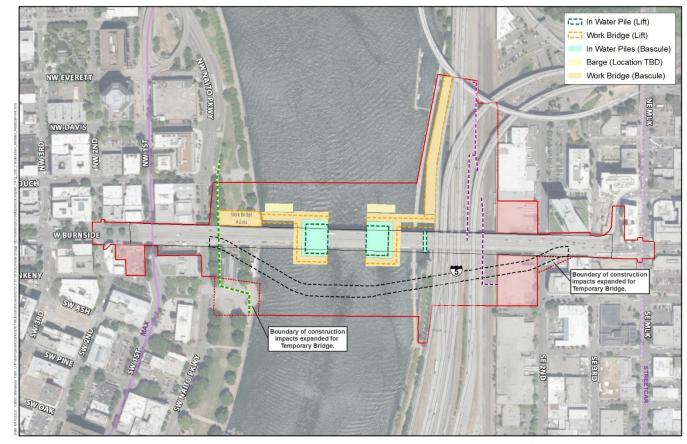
Construction Access and In-Water Work – Short-Span Alternative
